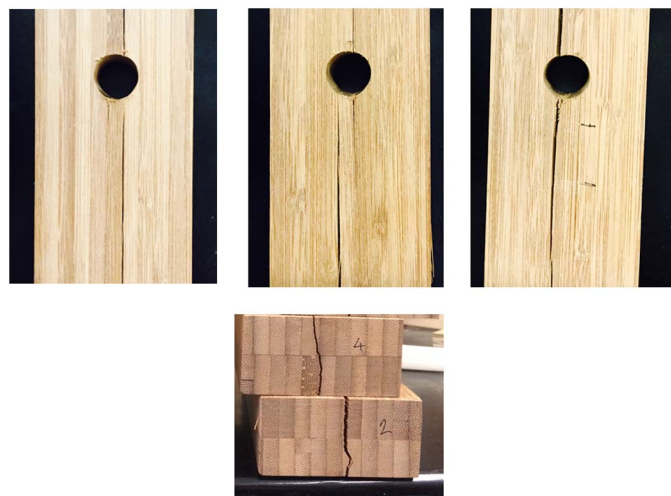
Splitting failure in LVB dowel joint when loaded parallel to grain
